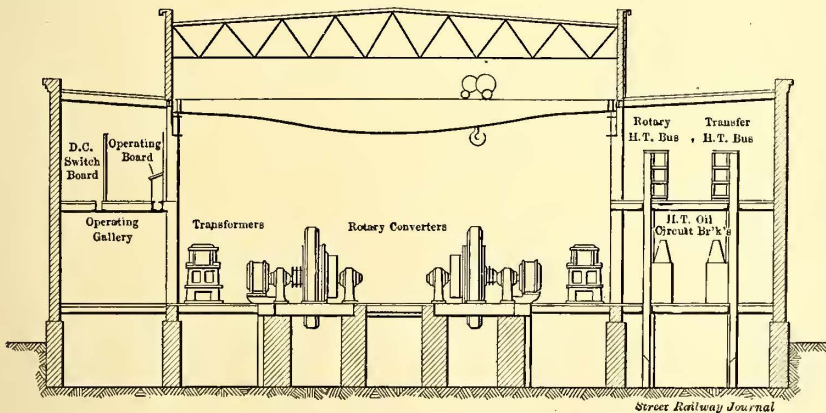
CROSS-SECTION OF TYPICAL SUB-STATION
